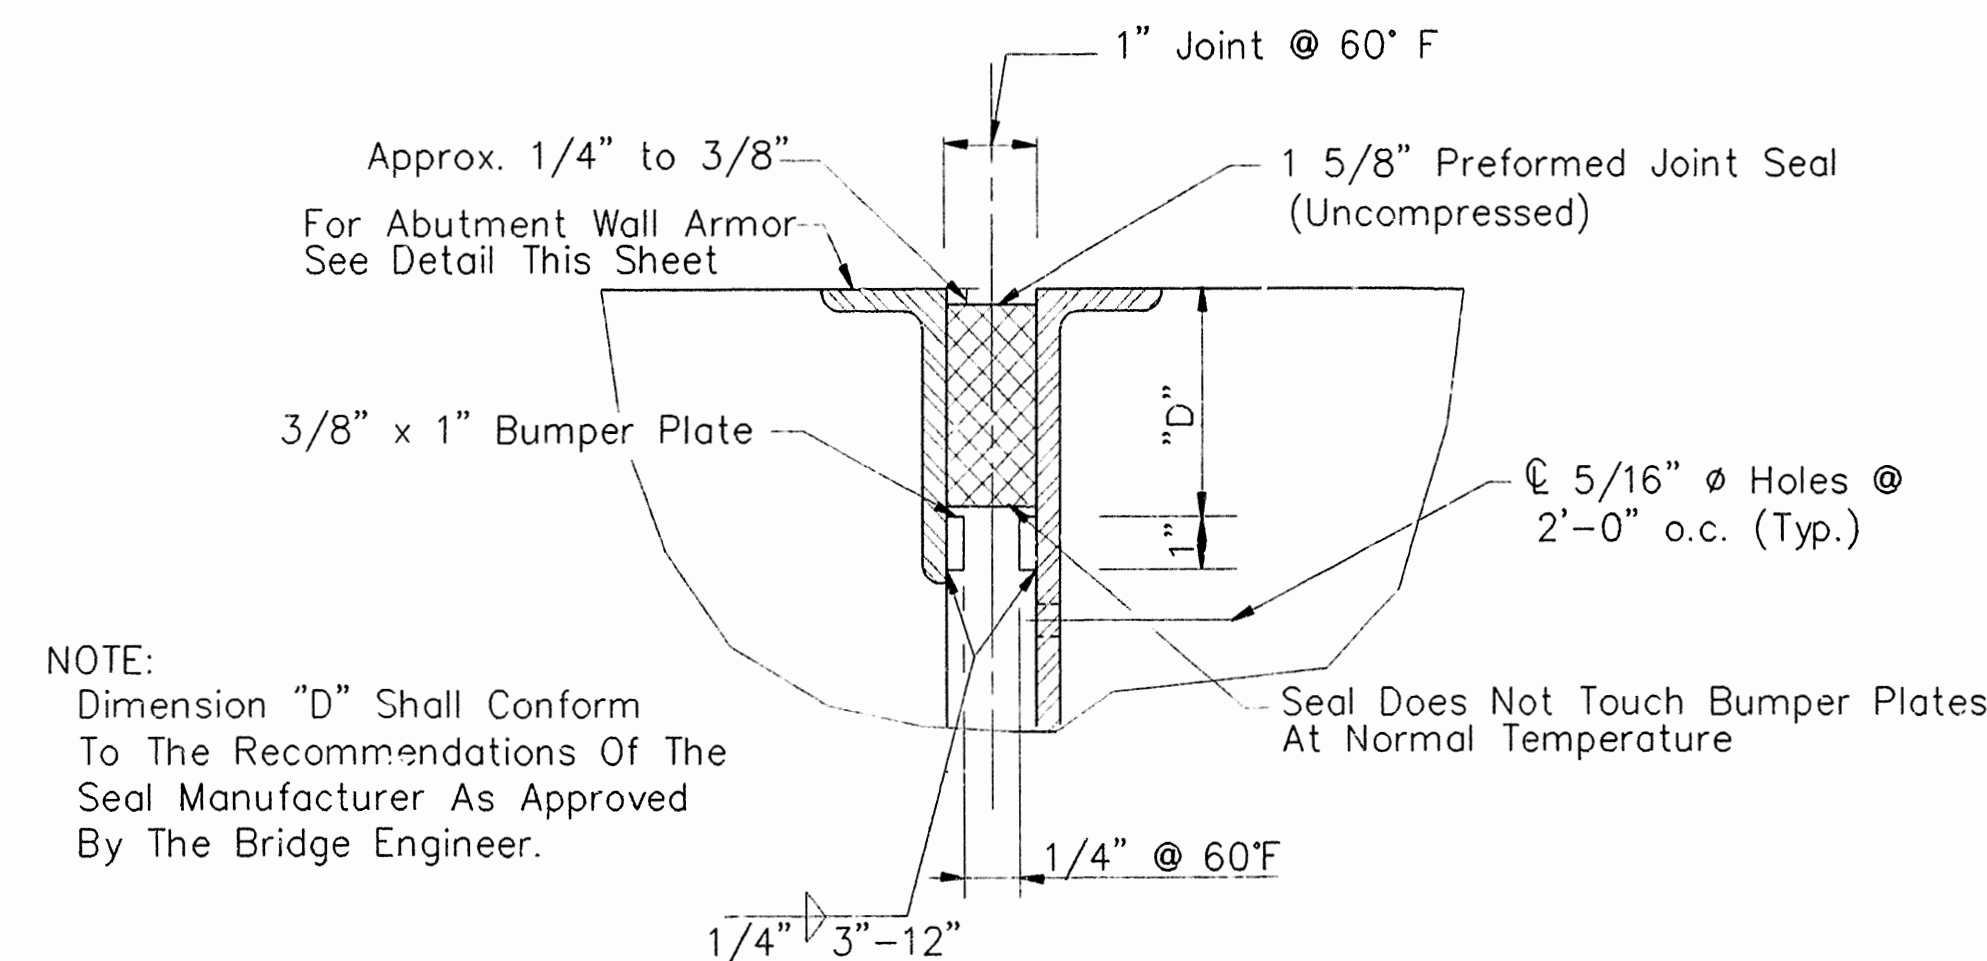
DETAILS OF PREFORMED EXPANSION DEVICE AT ABUTMENTS
